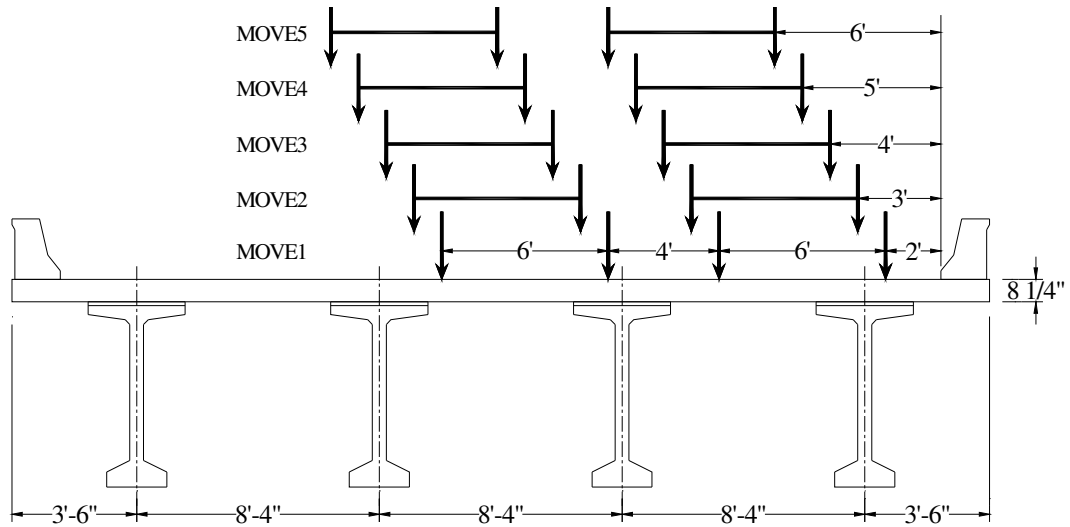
Sample Loading Positions for Two-lane Loads on Bridge #1
